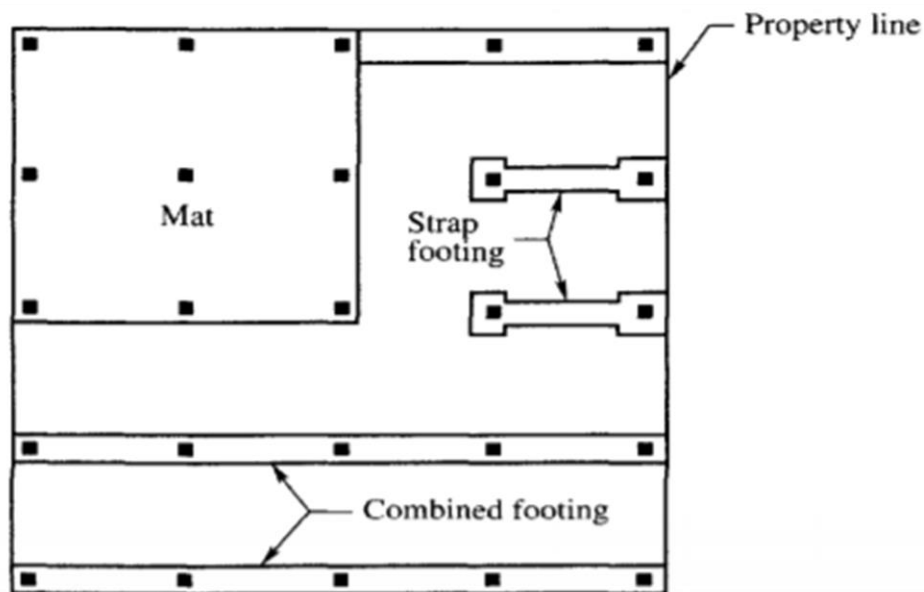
Raft foundation or mat and combined footing. Strap footing can be a special case of combined footing[17]
